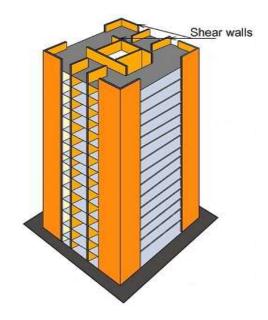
Shear wall configuration (Source:www.designingbuildings.co.uk)
